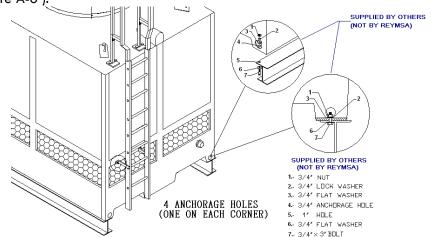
Installation - Typical Anchorage for a Single Fan Tower
